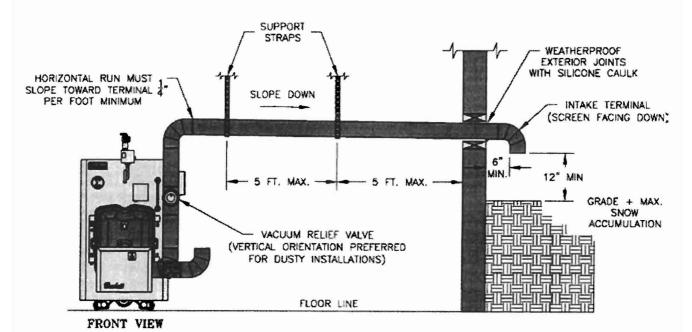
Optional Air Intake Piping Installation - Only Available with Beckett Burner
